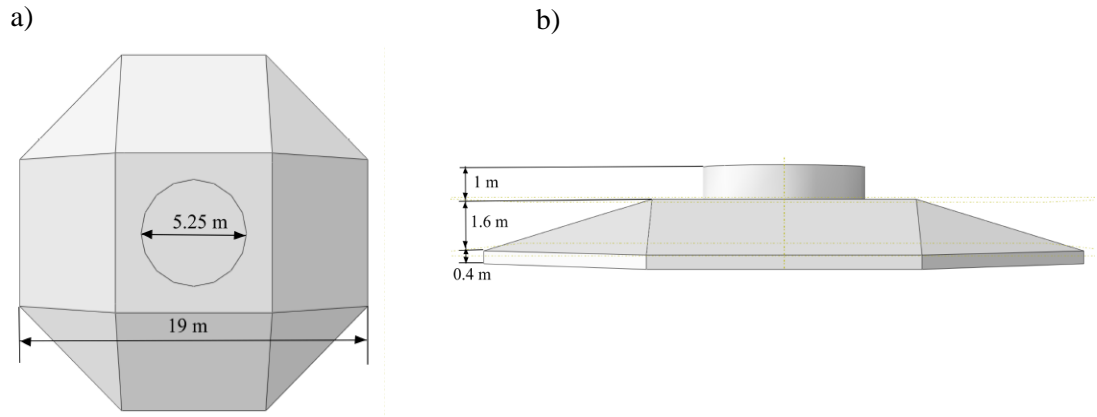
Foundation geometry; a) top view and b) cross-section (adapted from Deshpande, 2016)
